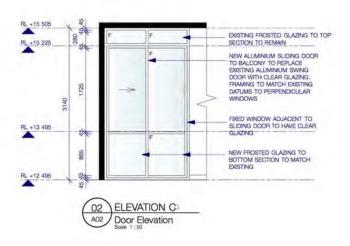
Internal Elevation showing proposed sliding door with RL's
